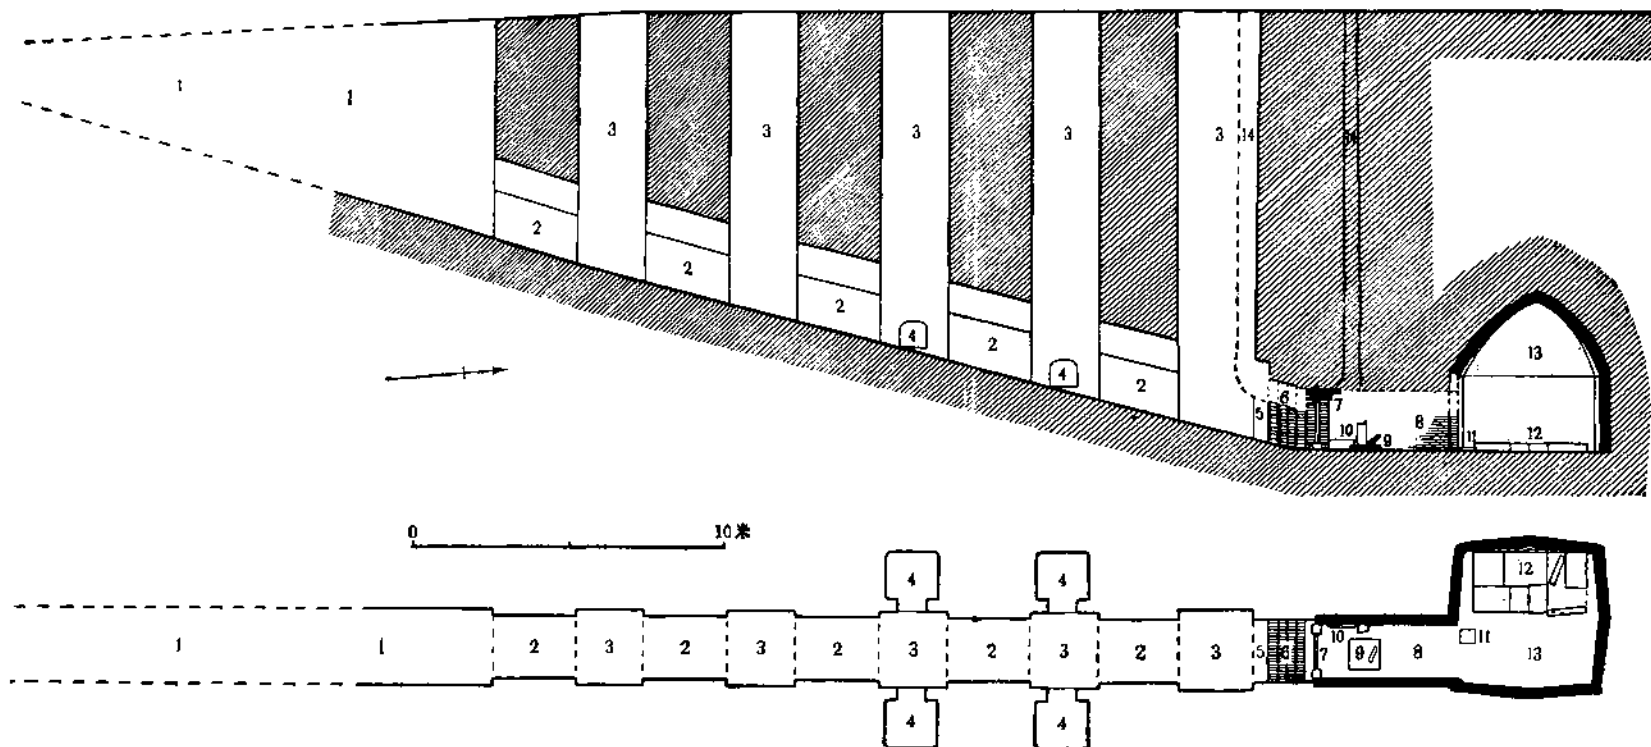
Longitudinal section and ground plan. Tomb of Zhang Shigui, Tang (658), Liquan, Shaanxi.
